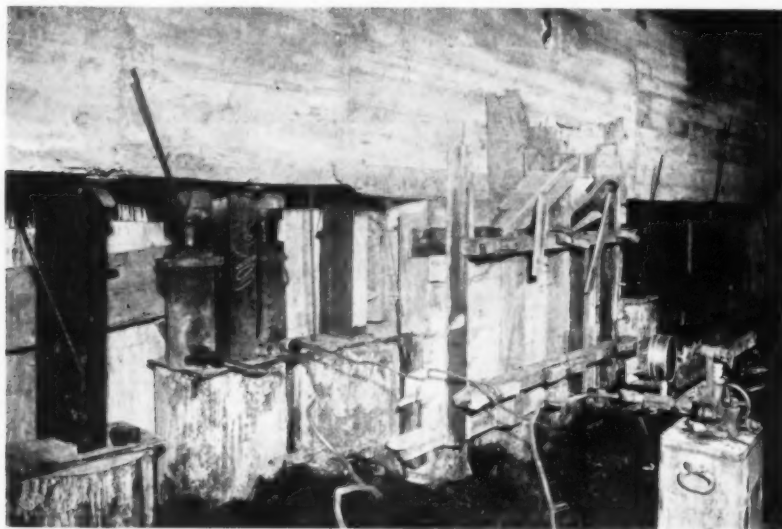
View of Foundation Showing Hydraulic Jacks Used to Force Piles Down as Building Progressed
